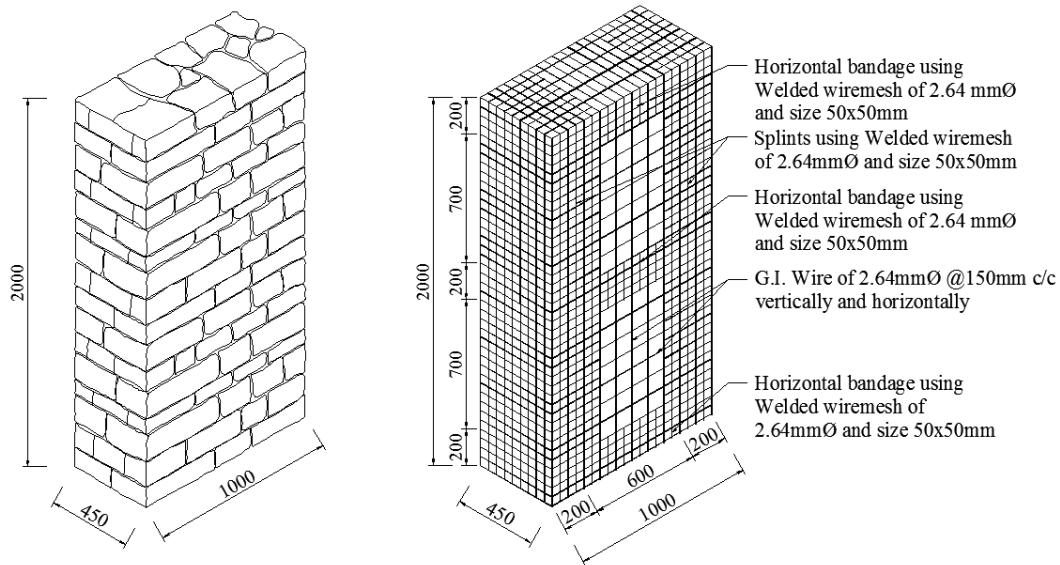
Isometric view of the test wall (left); WWM retrofitting detail (right)
